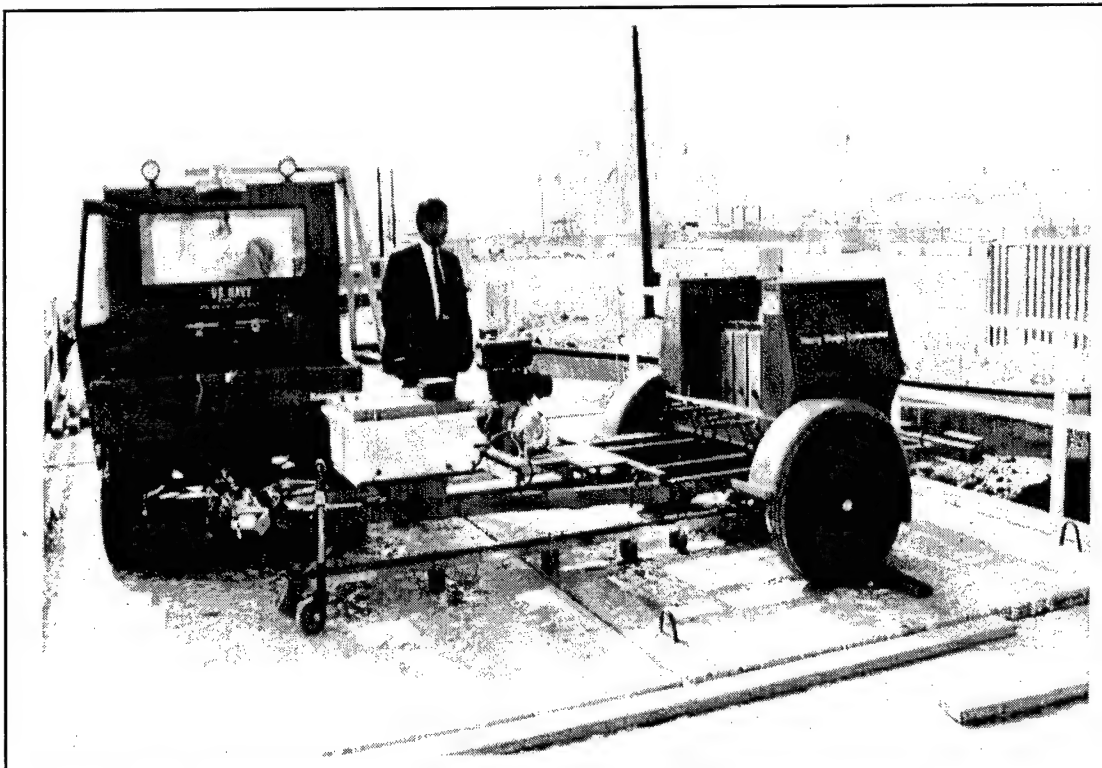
Falling weight deflectometer used in structural performance tests on the pier deck.
